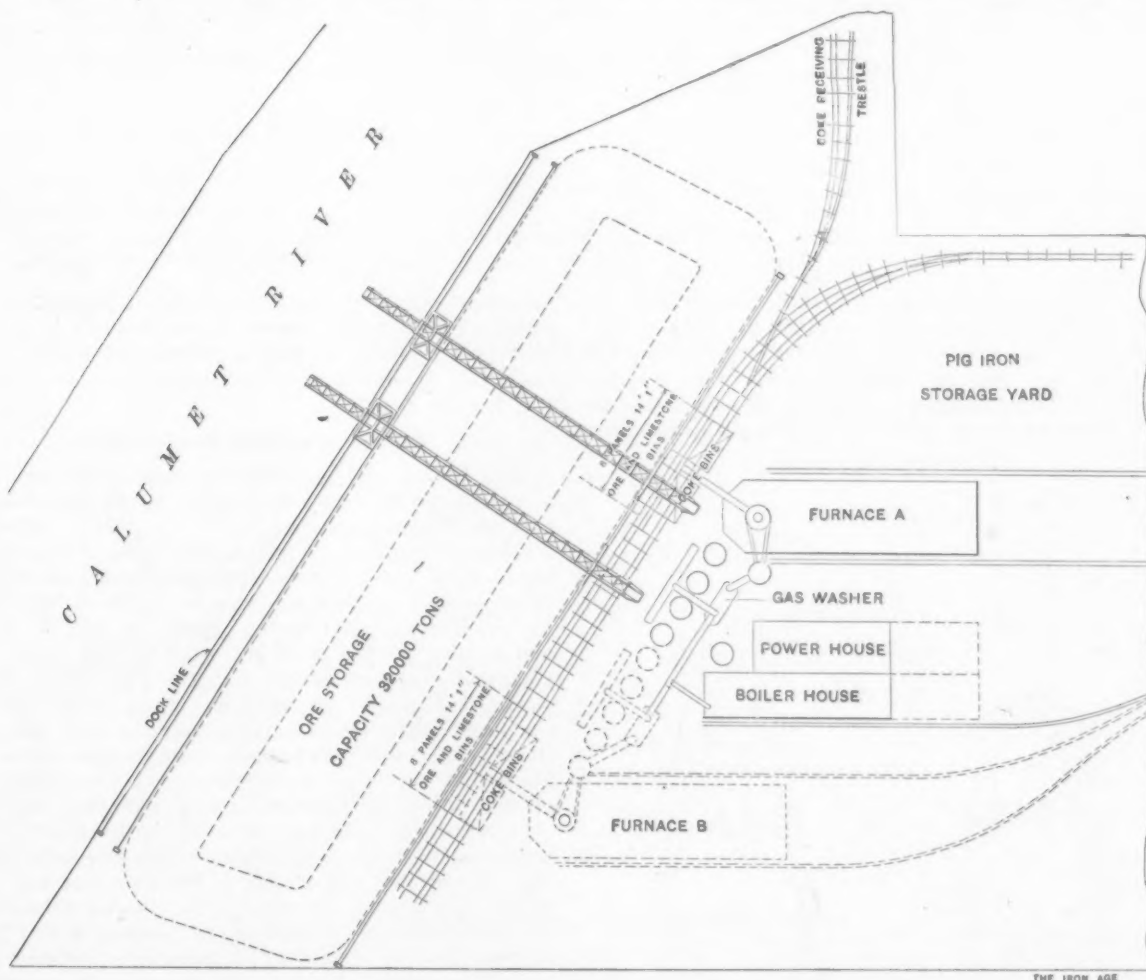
Plan of the Blast Furnace Plant and Ore Storage Yard of the Federal Furnace Company, South Chicago, Ill.
